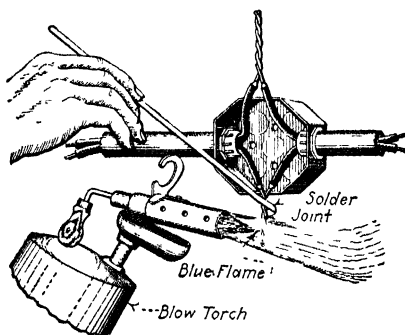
Soldering a joint with a gasoline blow-torch.
